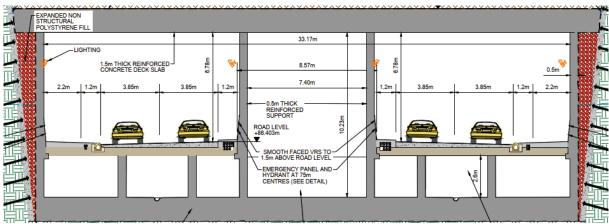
Typical Cross-section through cut and cover tunnel
